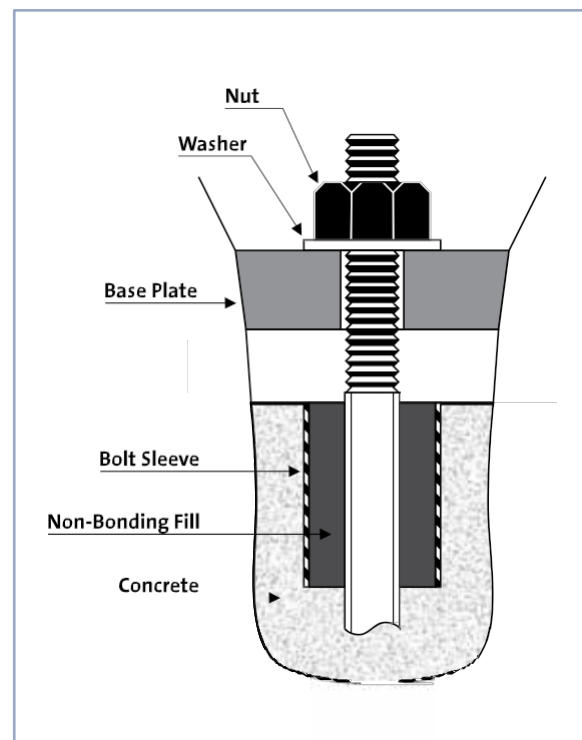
Anchor Bolt and Pipe Sleeve Detail
